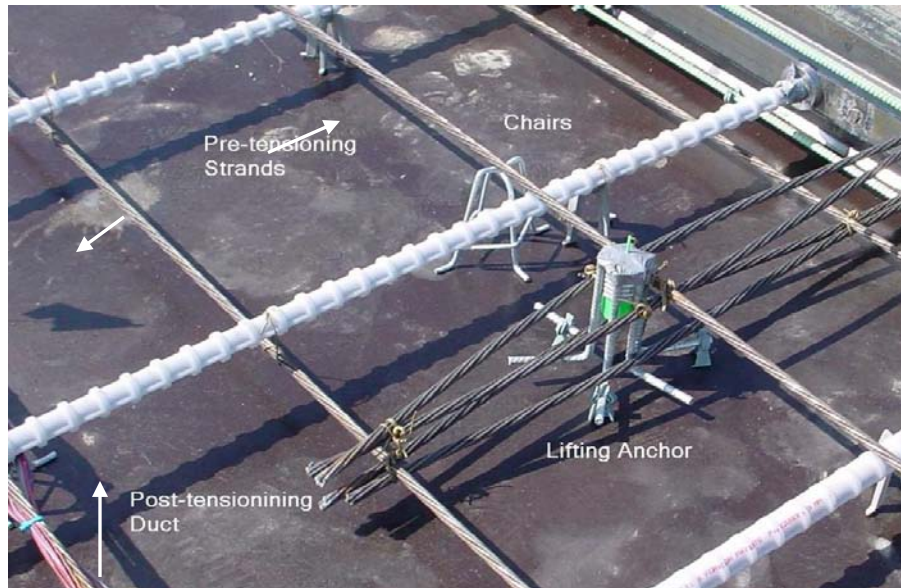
Lifting anchor, chairs, and prestressing strands
